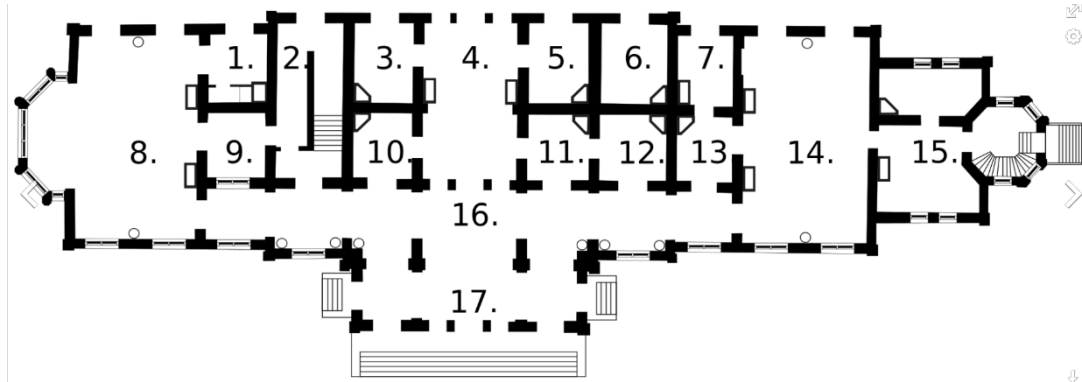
The ground floor plan of the Helsinki Old Railway Station [53]
